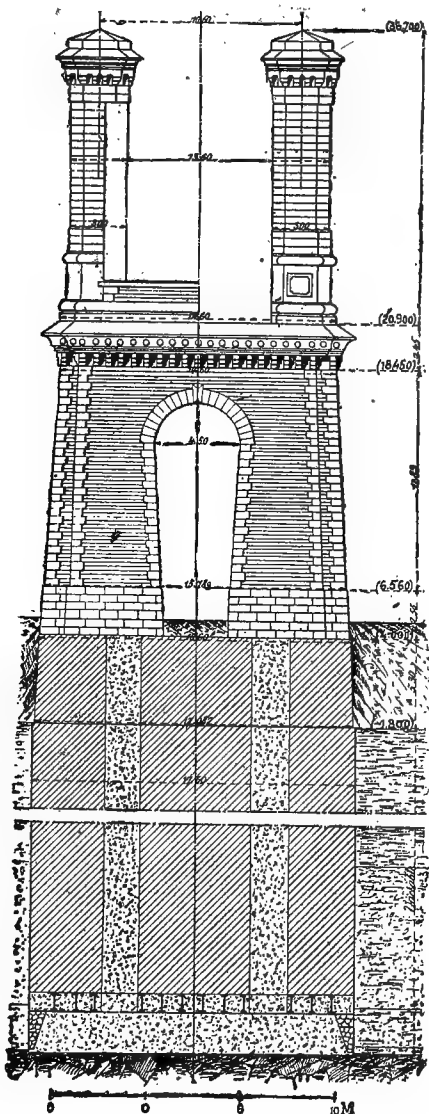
Elevation of an abutment of the Cubzac bridge over the river Dordogne.
